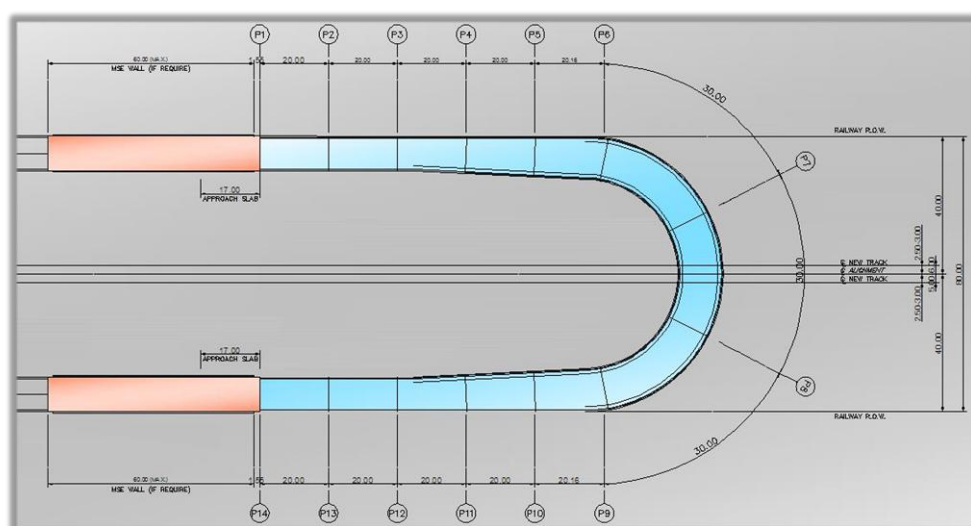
Typical Plan of U Turn Bridge
